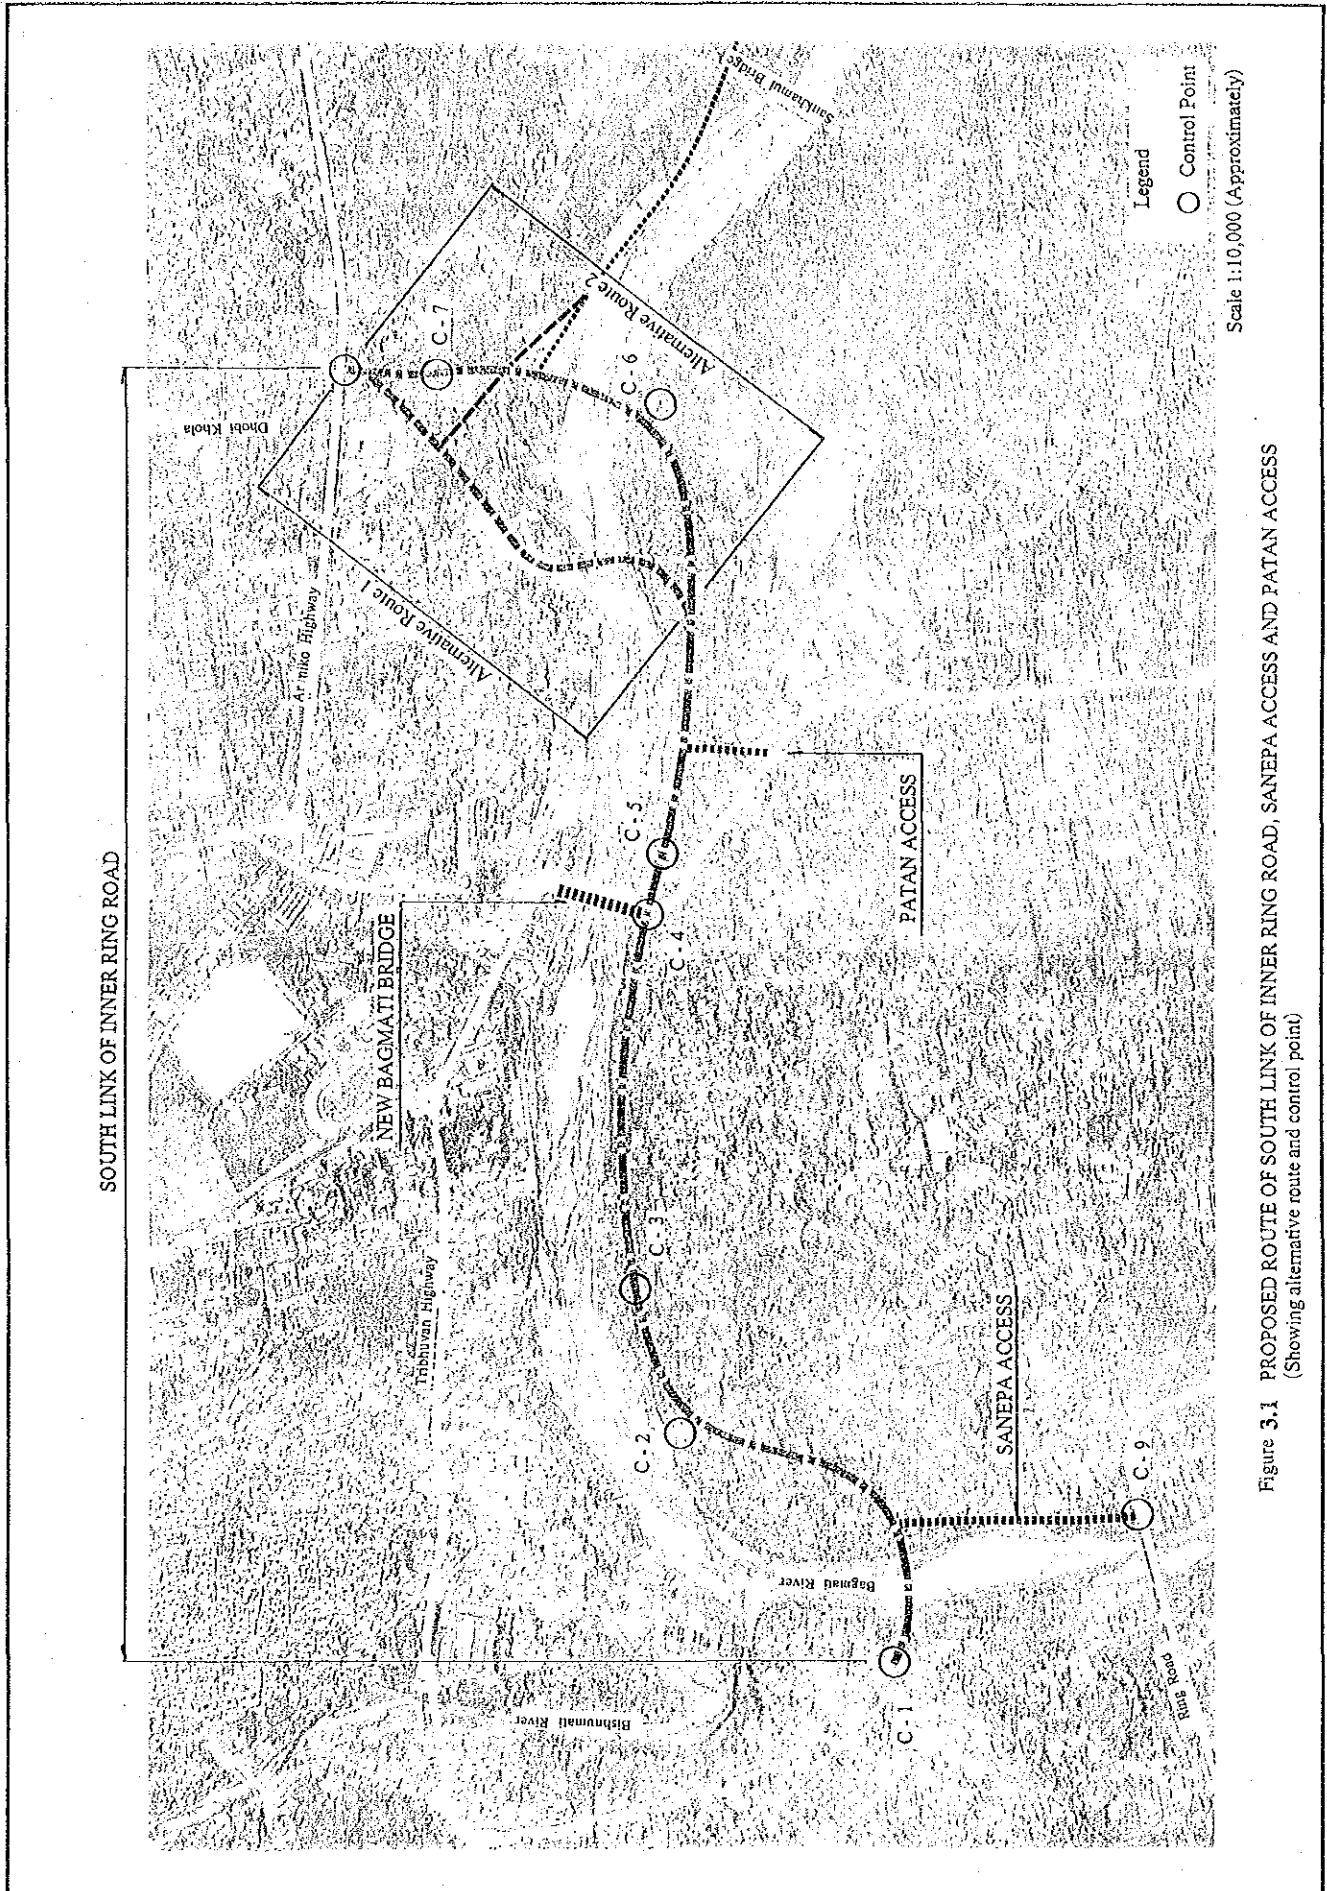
PROPOSED ROUTE OF SOUTH LINK OF INNER RING ROAD, SANEPA ACCESS AND PATAN ACCESS
